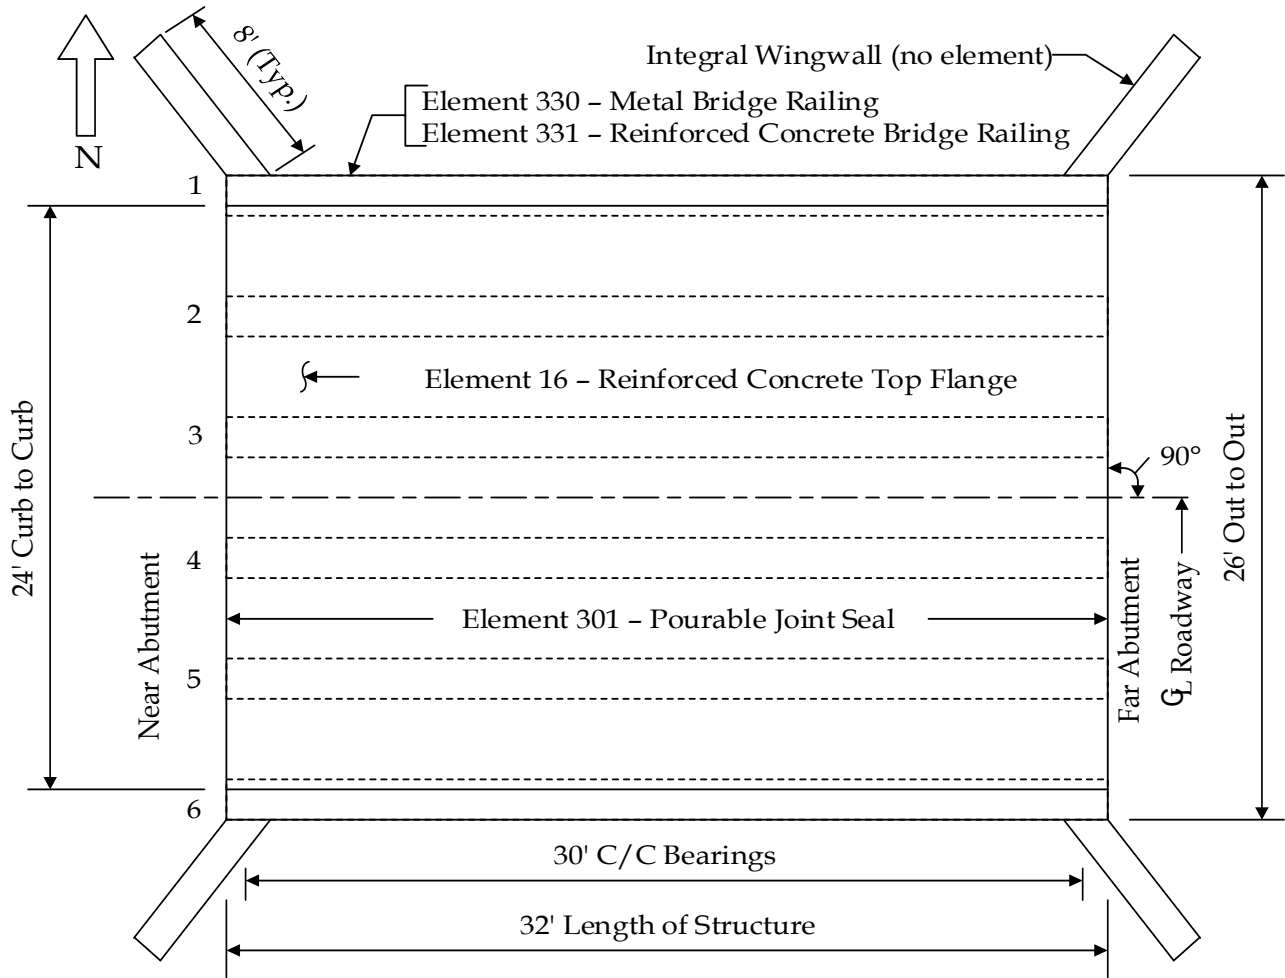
Plan View of Reinforced Concrete Tee Beam Bridge
